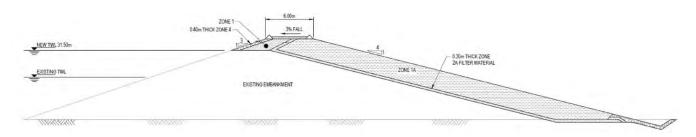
OHD upgrade typical section (GHD, 2021)
